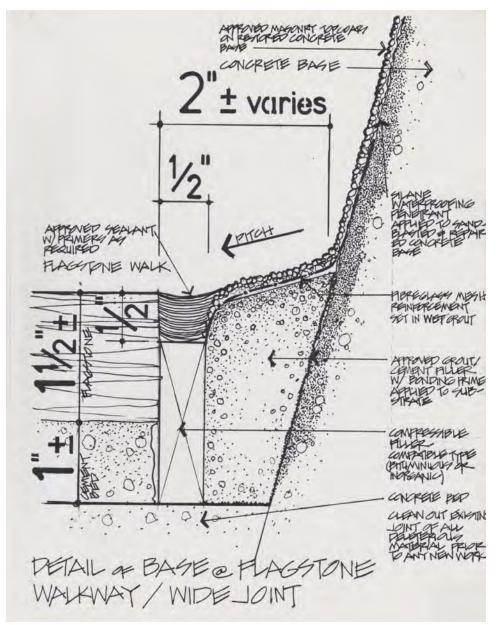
1986 Construction Detail at Base at Flagstone Walkway. Eberson and Toto, Detail 1/5.
